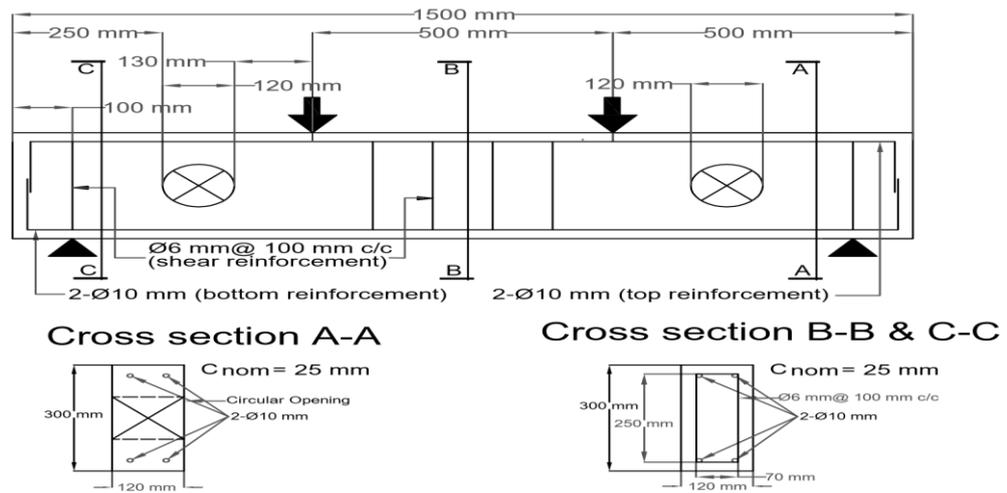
Arrangement of reinforcement bars in RC beam with circular opening
